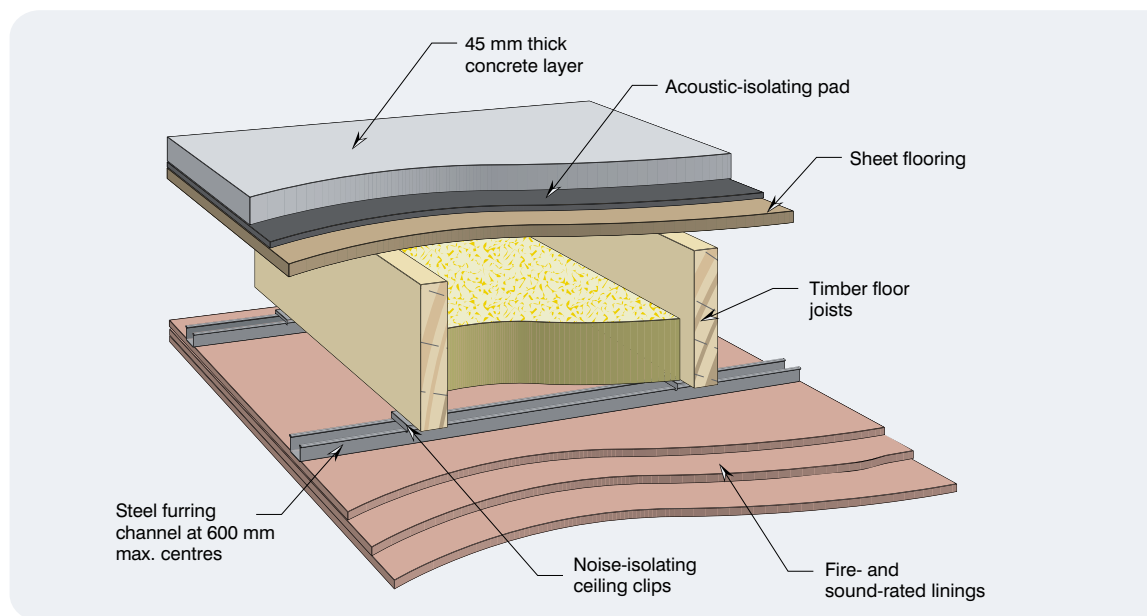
Adding mass to floor system through the use of concrete topping.
